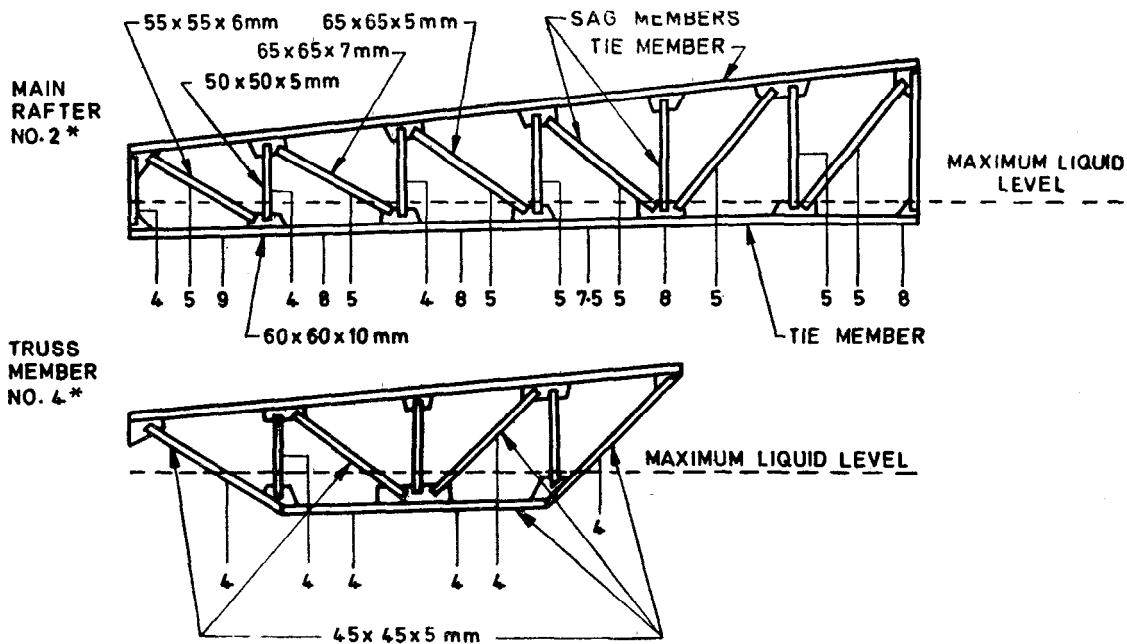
TYPICAL EXAMPLE OF ROOF STRUCTURE MEASUREMENTS
